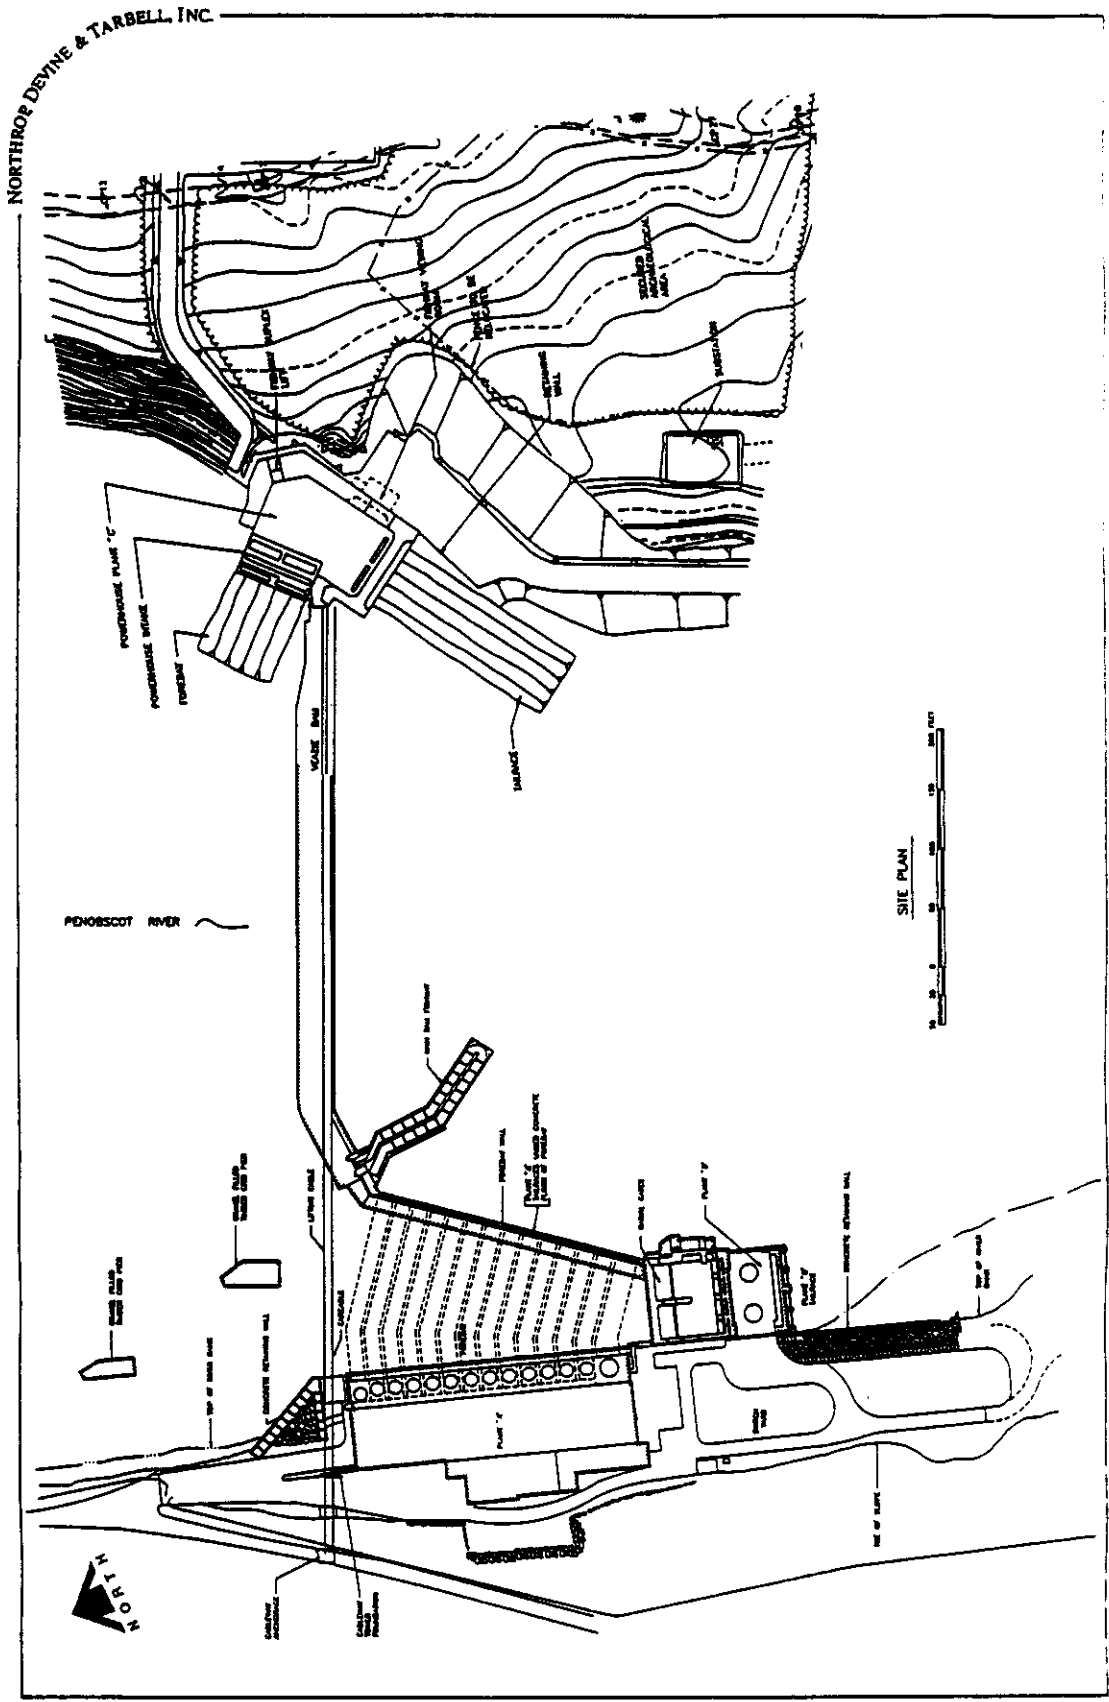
Proposed site plan for Plant C Veazie Development (Source: BHE 1992b)
